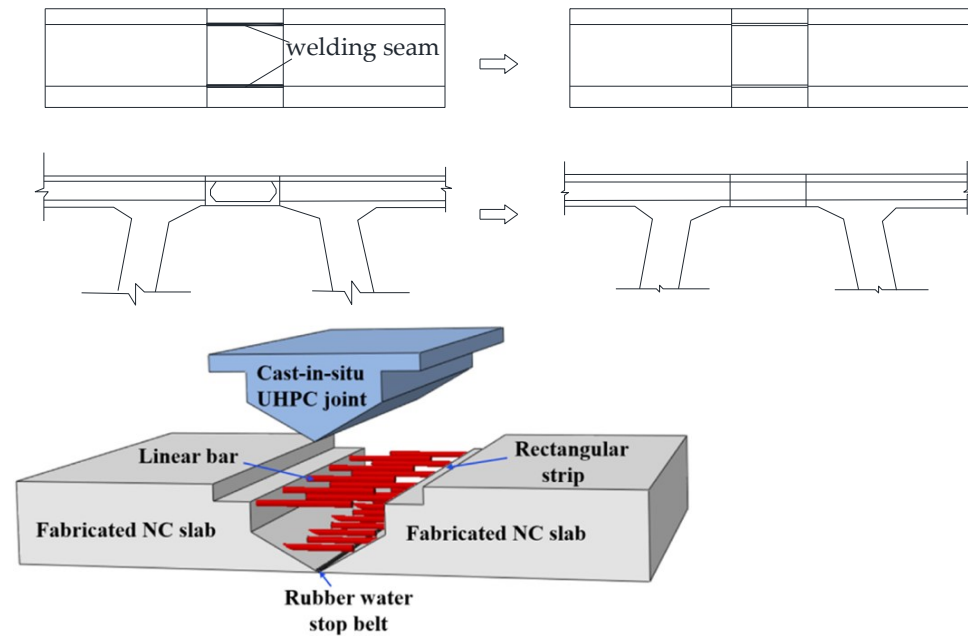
Structure of the UHPC joints of small box girders [61,74]
